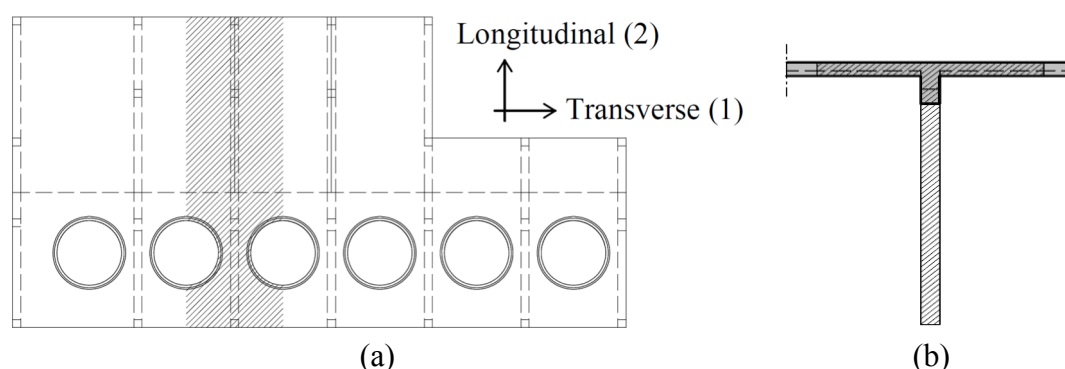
Modelled geometry of the structure, marked with diagonal hatch: (a) Top view; (b) Cross sectional view.
